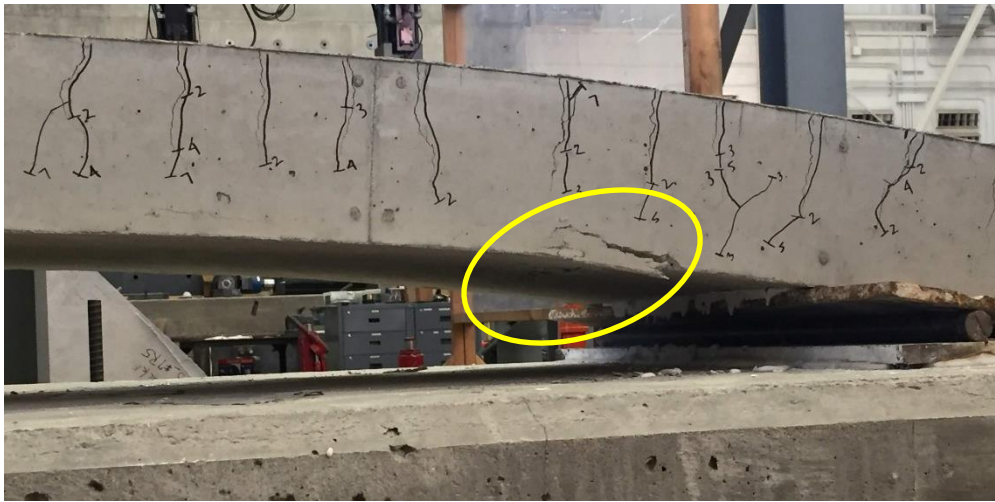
Initiation of S-80-5 Failure – East Elevation
